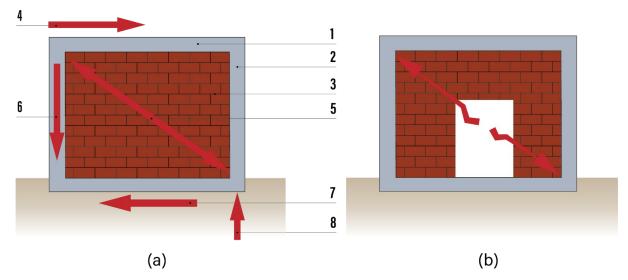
A strong confined masonry wall with tie beams (1), columns (2) and masonry (3). When an earthquake strikes (4) it is resisted by diagonal compression in the wall (5) and tension in a tie column (6). The horizontal earthquake force is resisted by the ground (7) and the vertical force also by the ground (8). In (b) the wall has an opening that prevents the formation of diagonal lines of force and that greatly weakens the wall.
